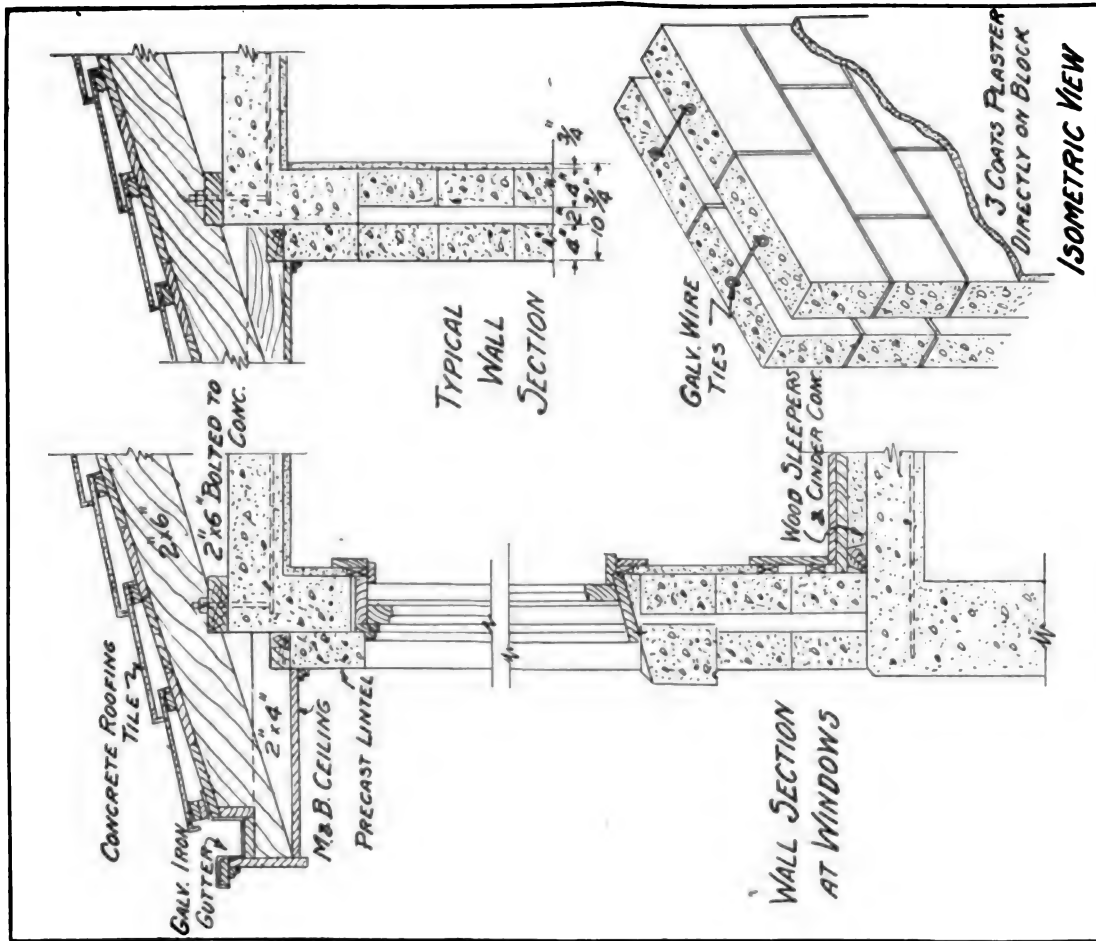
DETAIL OF CONSTRUCTION WITH TWO-PIECE CONCRETE BLOCK HELD BY TIES IN THE JOINTS TO FORM A DOUBLE WALL
